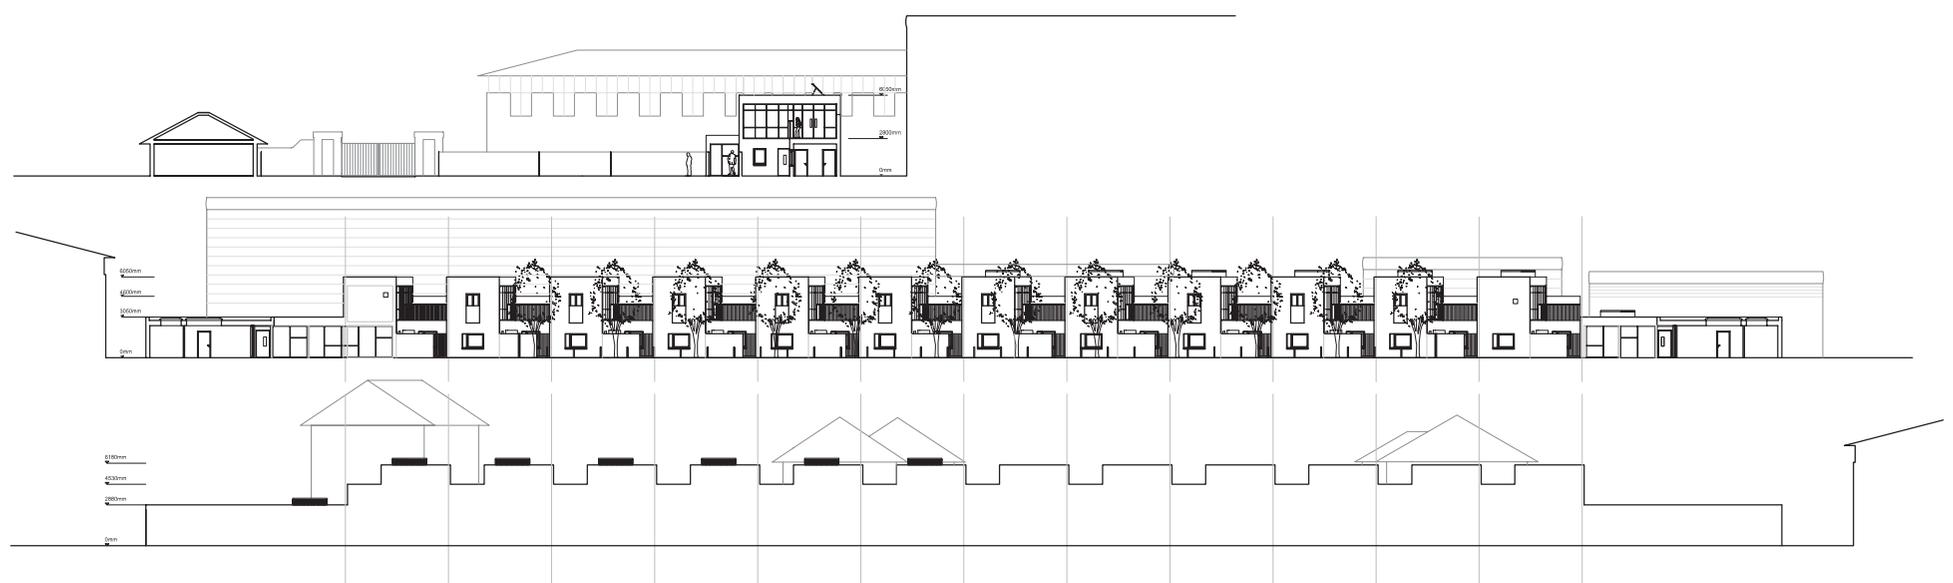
Baden Powell Close: Sectional Elevation 2.
